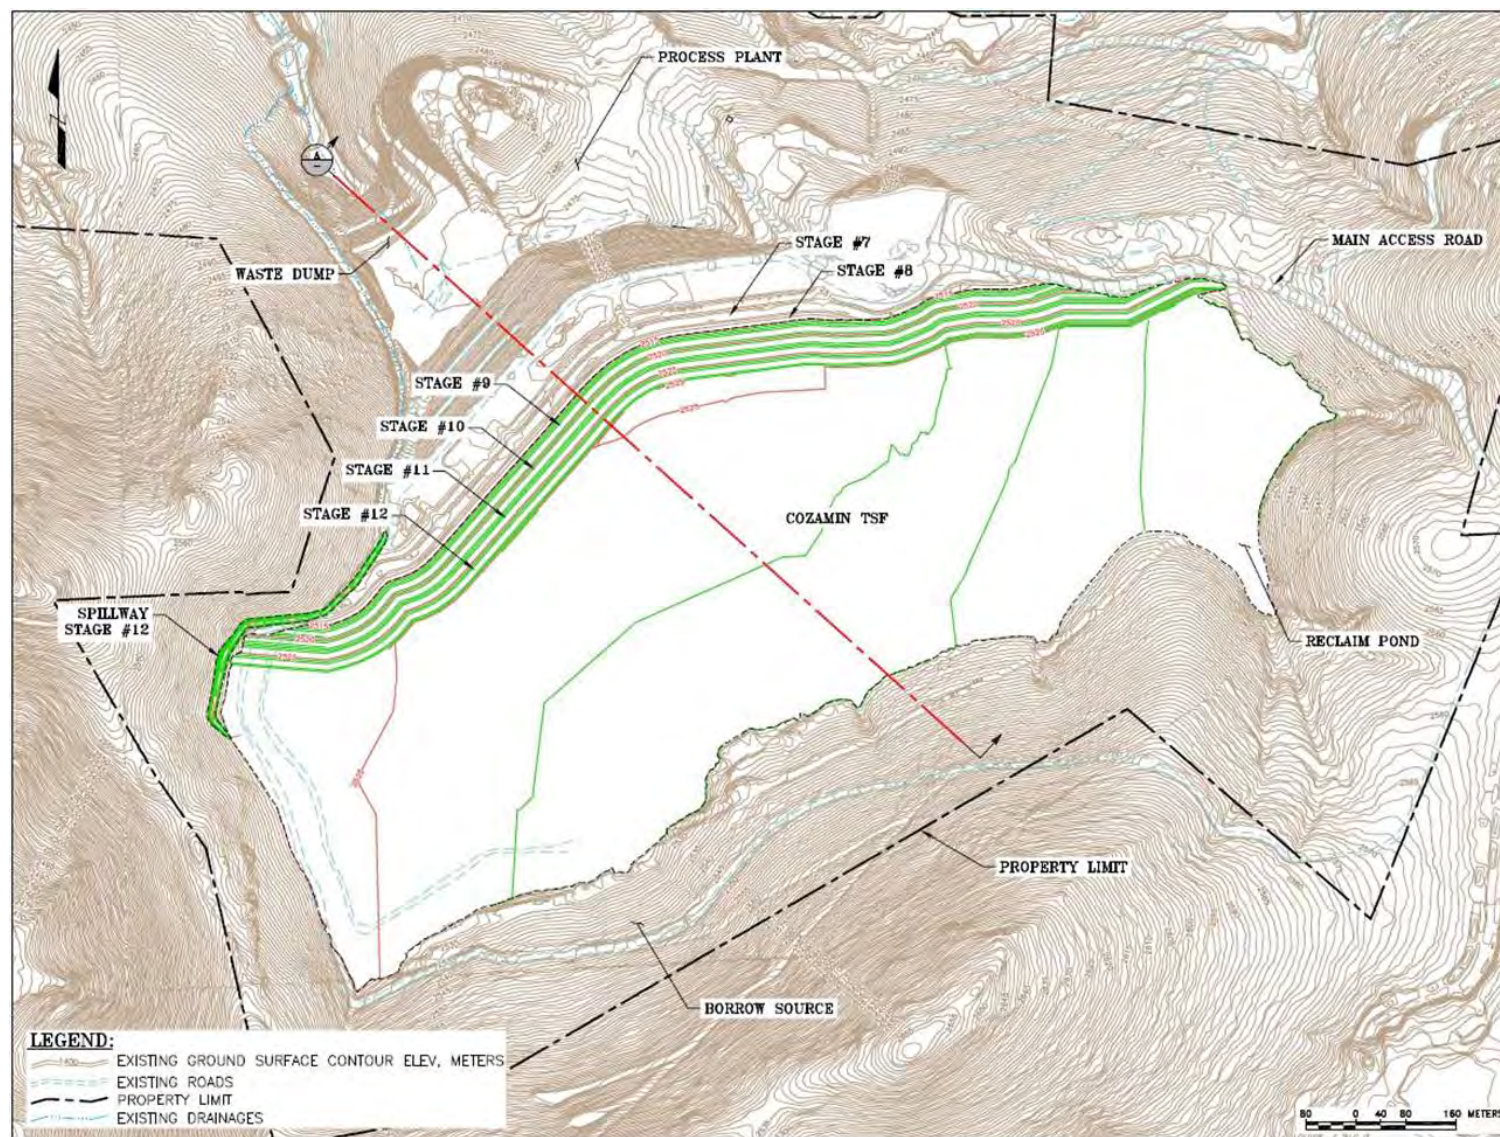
TSF Stages 6 through 12 Plan View (Wood, 2020)
